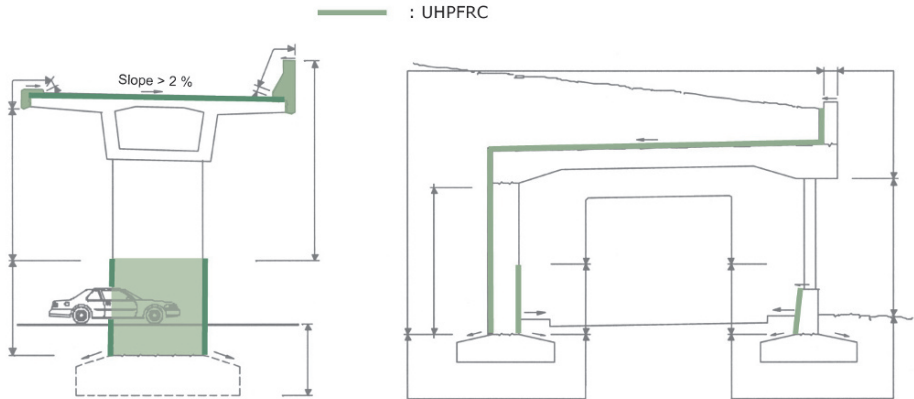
Concept of application of the local “hardening” of bridge superstructures with UHPFRC
